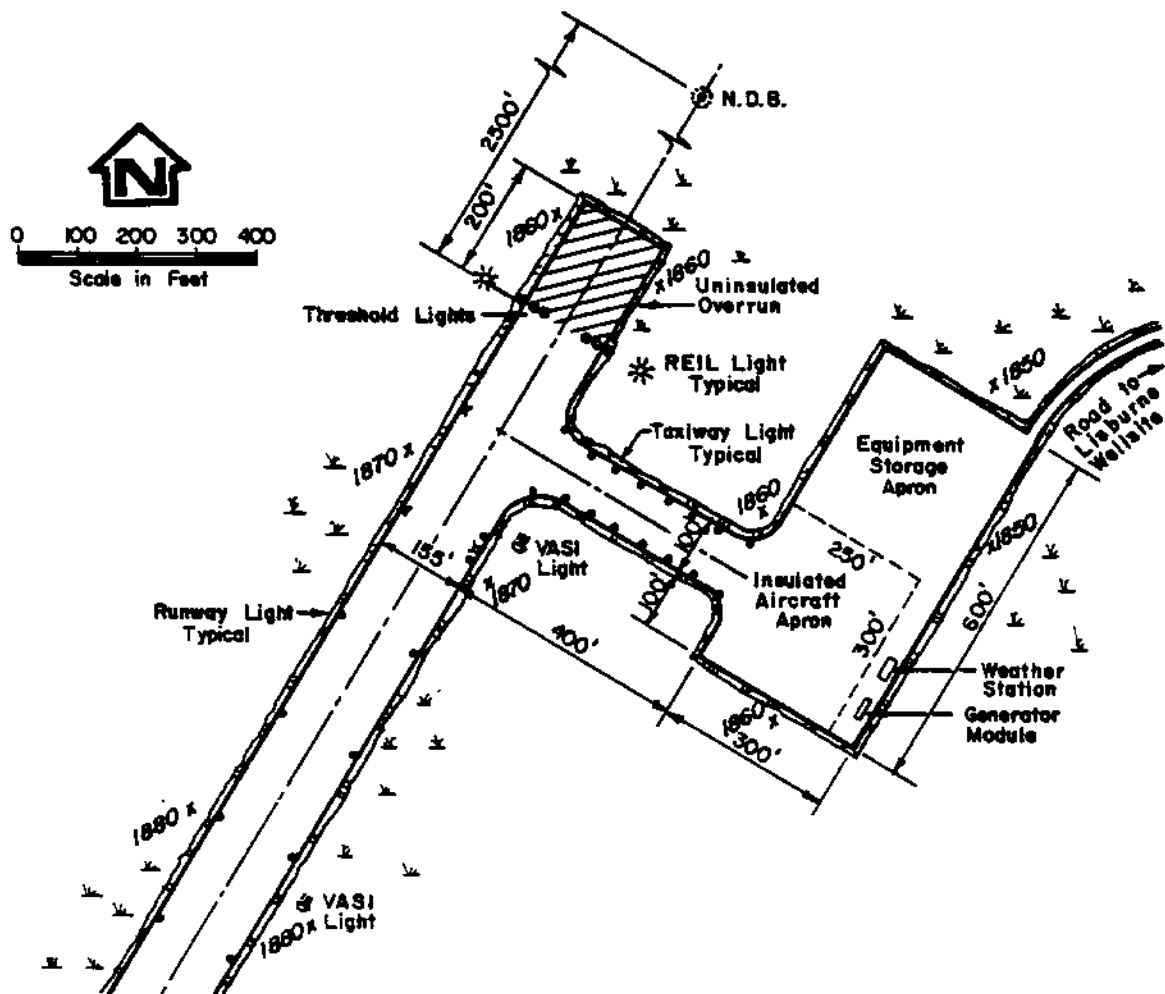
NORTH END OF RUNWAY & APRON LAYOUT
